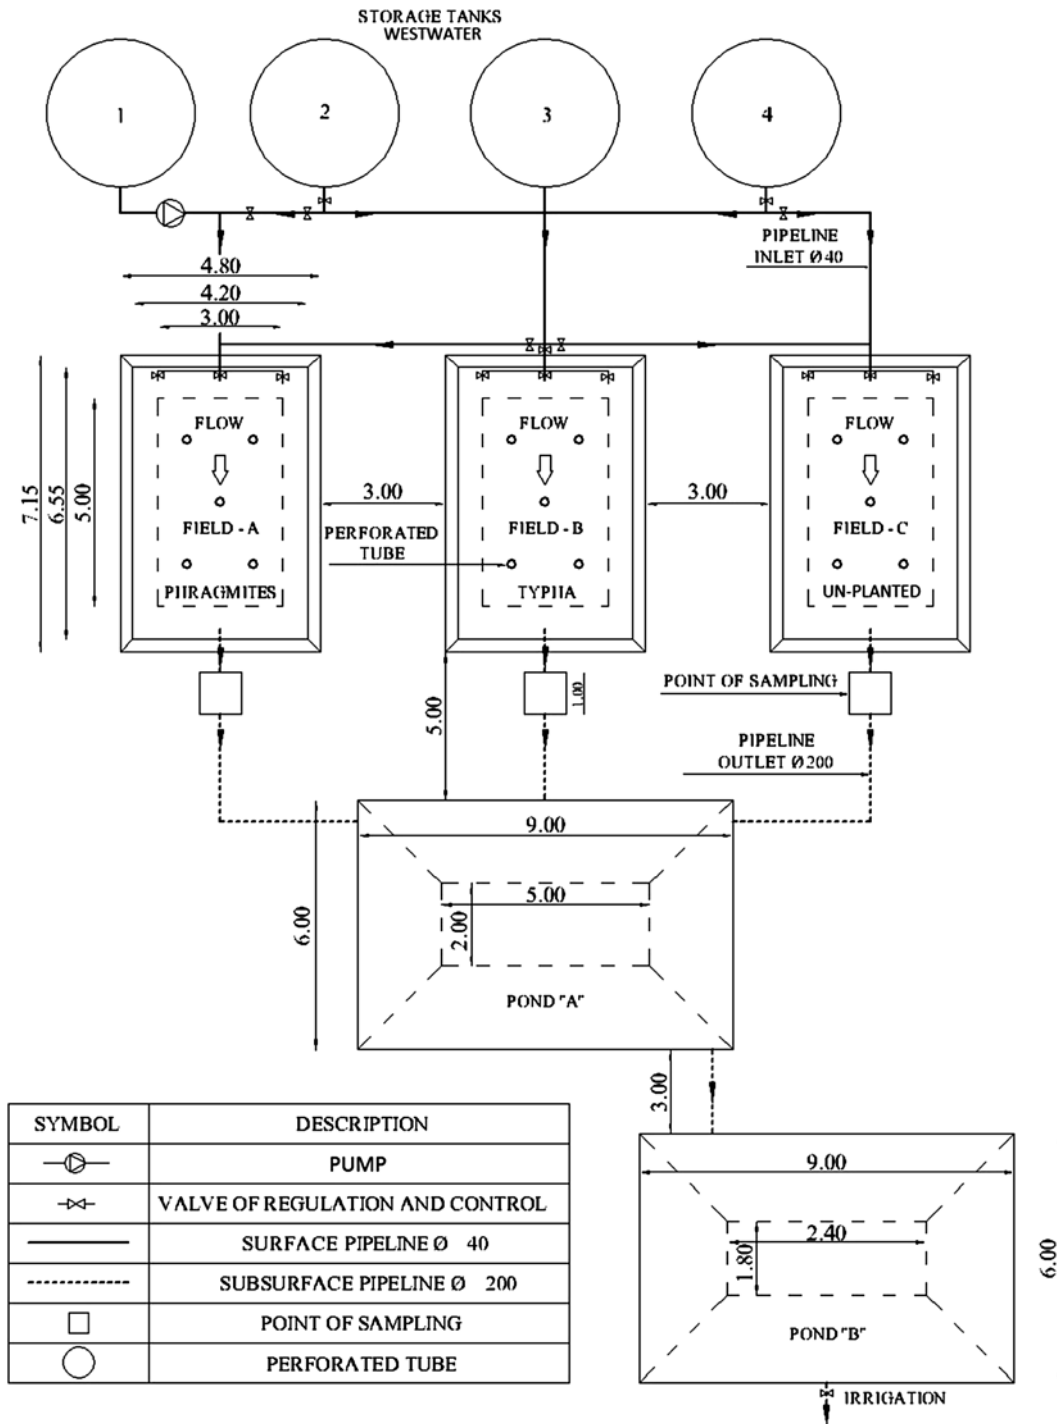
Constructed wetlands pilot plant at Sternatia di Lecce, Italy—plan view.
